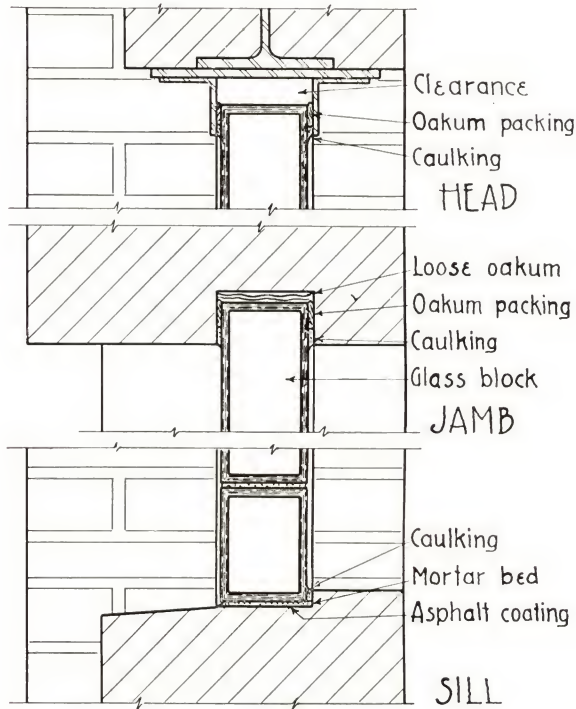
Crosssection view showing method of setting glass blocks in a masonry wall.
